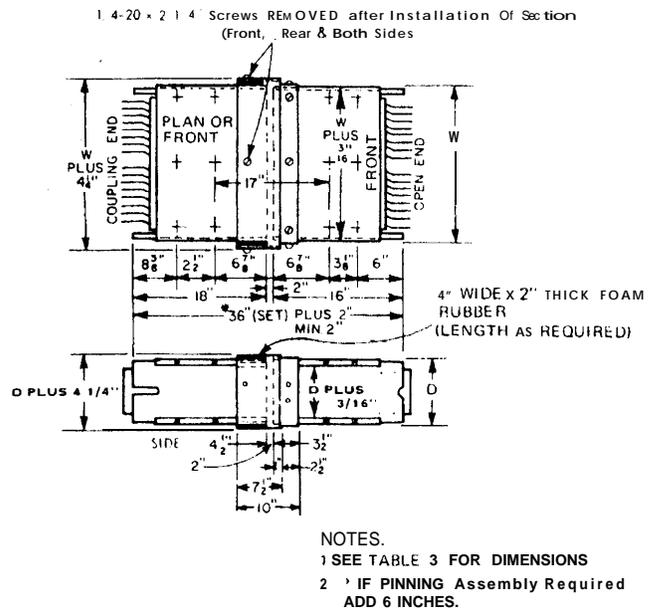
Shock-Expansion Section (Horizontal or Vertical).
